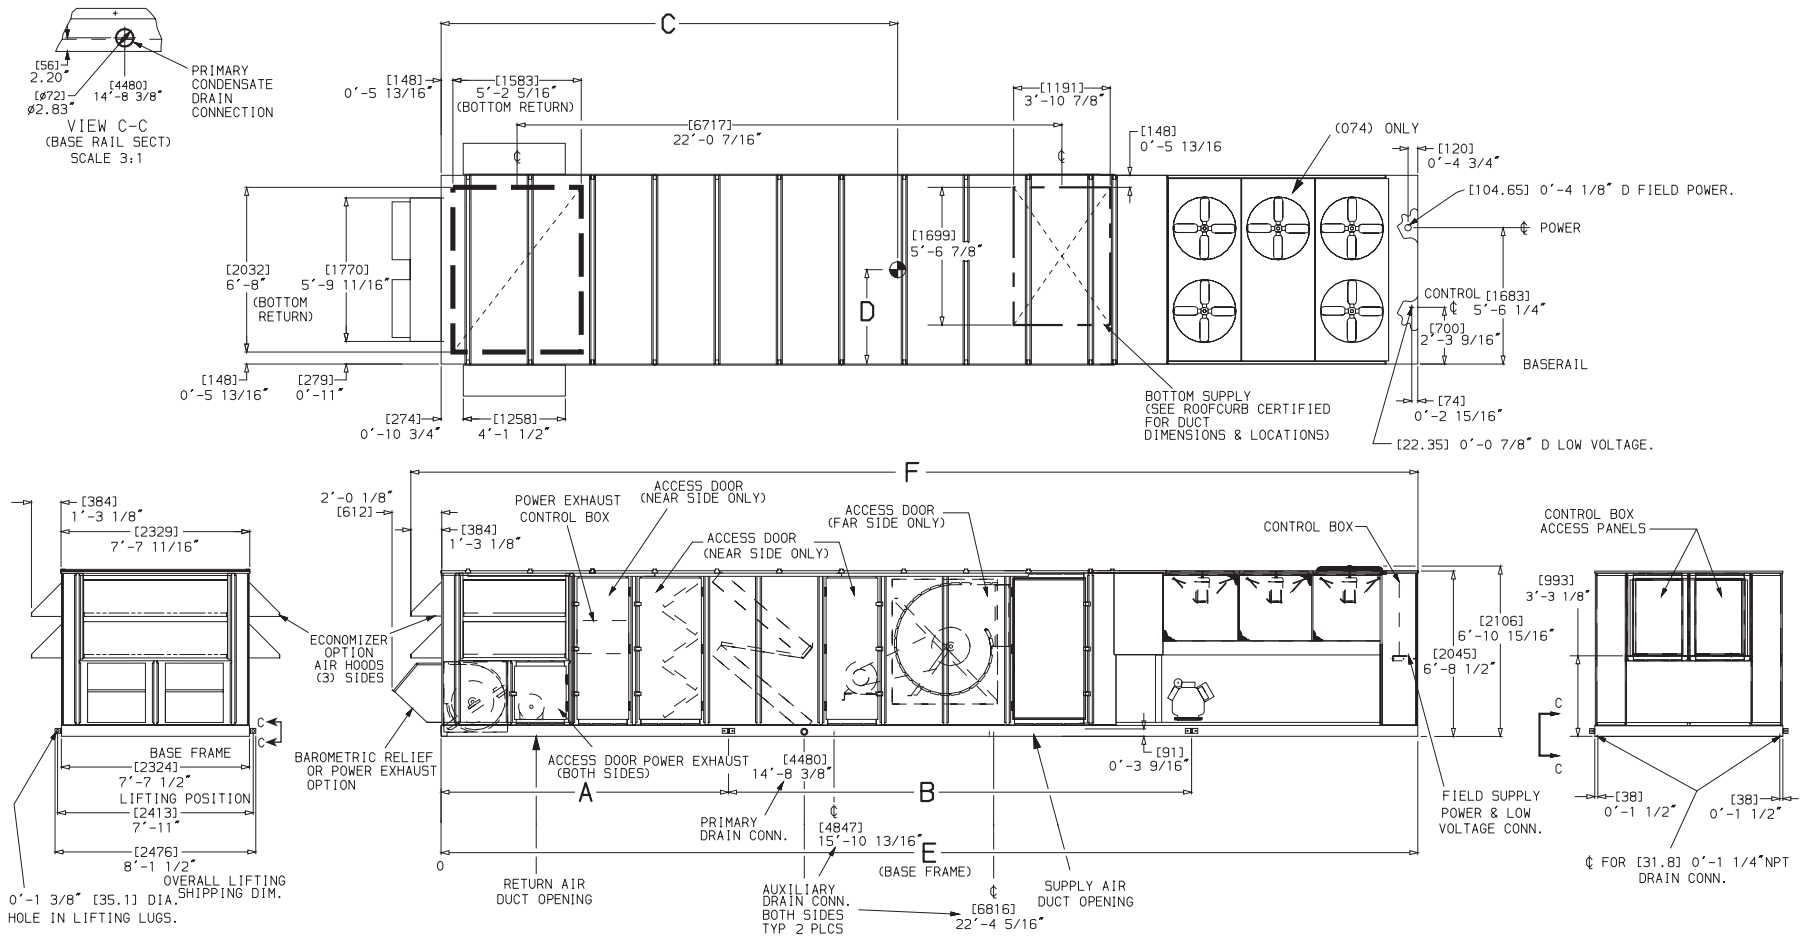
Fig. C — Base Unit Dimensions — 50FJX,FJY,FKX,FKY,FPX,FPY054-074 Units
